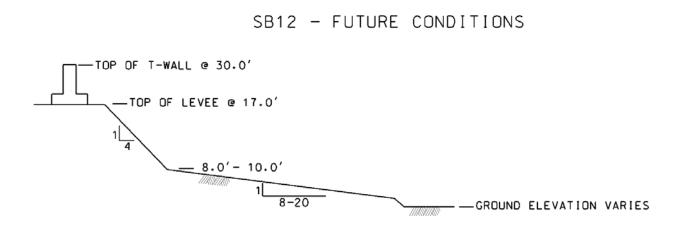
Typical Levee Design Cross-section MRGO Levee/Floodwall Combination (SB12)
